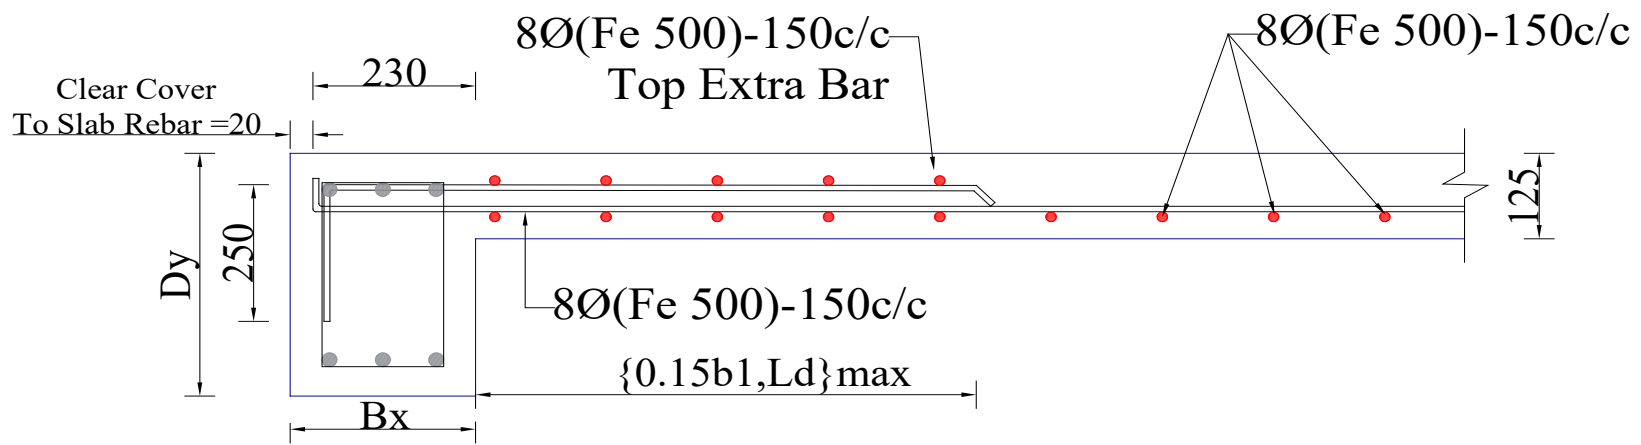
TYPICAL FLOOR SLAB DETAIL (OPTION I)
